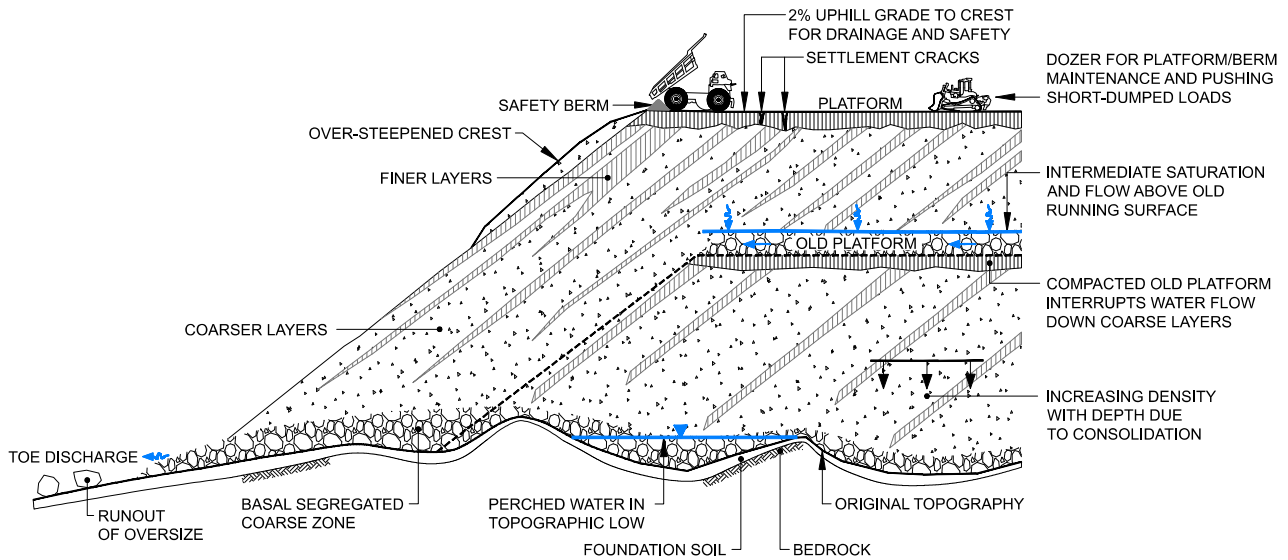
Schematic cross-section of a large waste dump at an open pit mine
